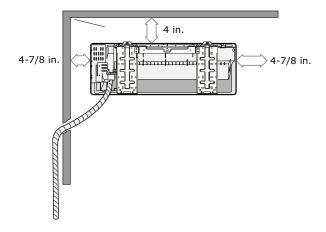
Dimensional Drawing: 4TVW0018/24/27\*\
